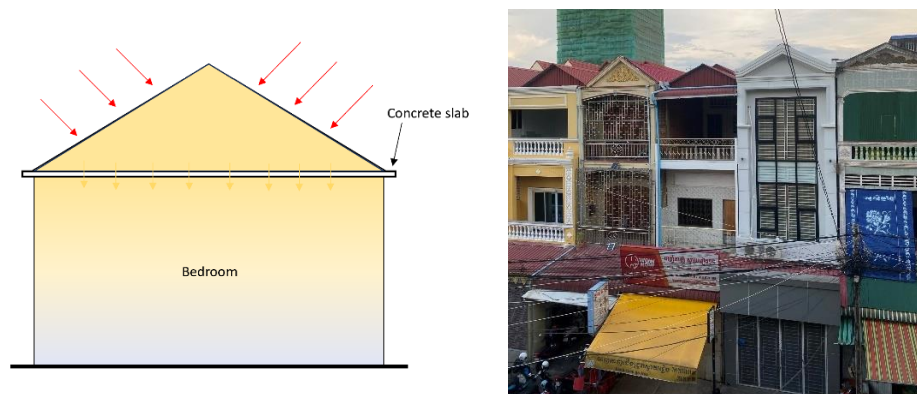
Example of house design with a gable roof that transforms into a heat box.
